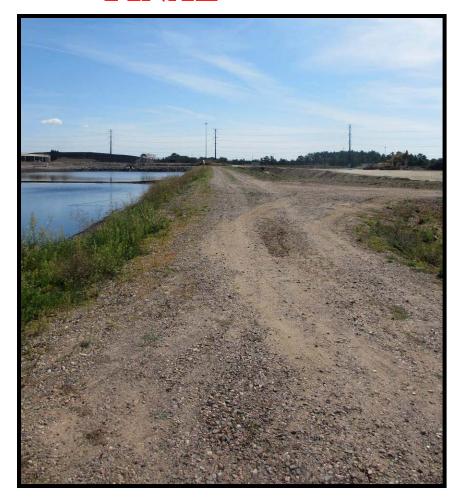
Crest along Southwestern Secondary Pond's berm
